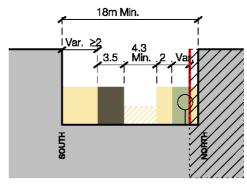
Street coding section: between Plot G and the ViBe Student Living building.
